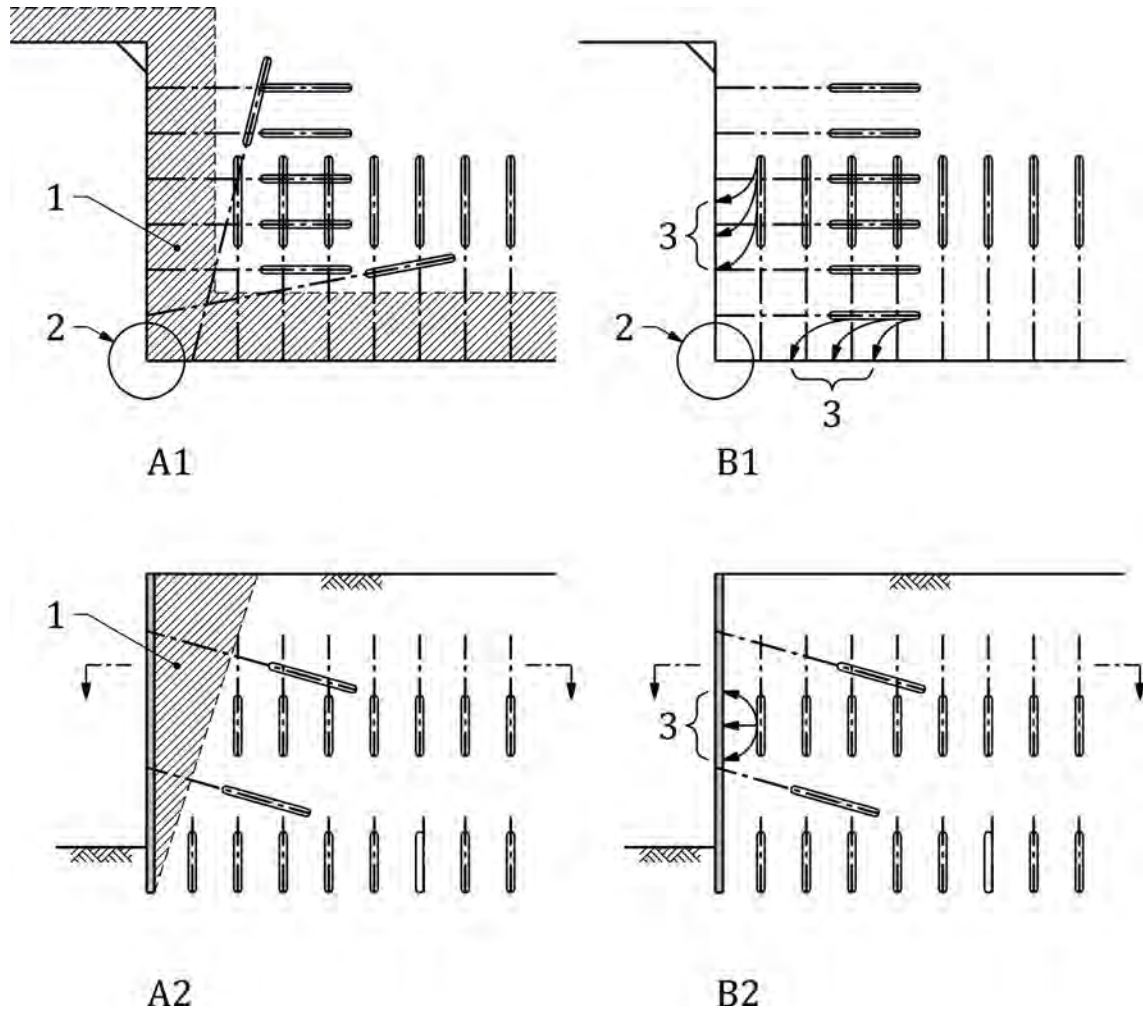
Examples of good (right side) and bad (left side) anchor configurations in stratified ground
